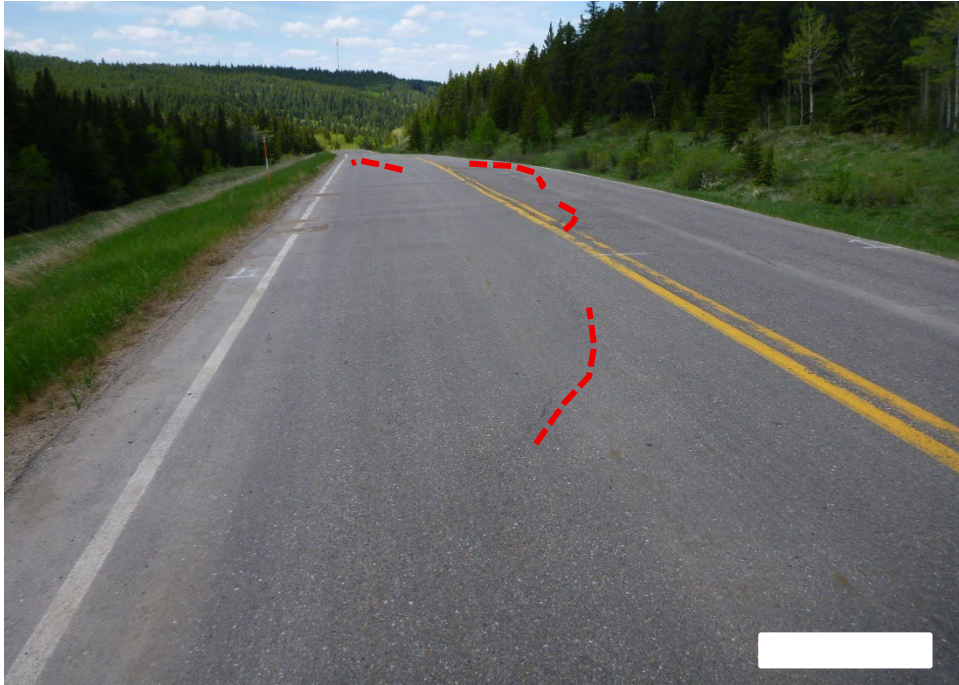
Pavement cracking and settlement (red dashed line) reflected through a recent pavement patch at Site A. Photo taken May 28, 2025, facing northwest.
